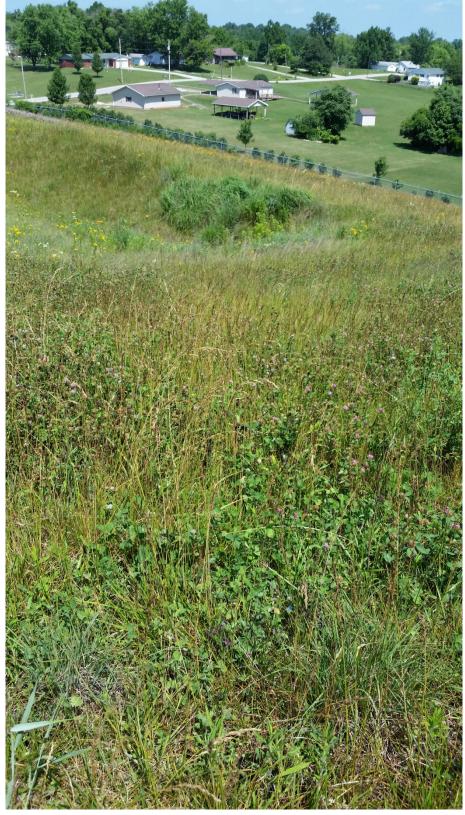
ES4 East Plant Area Cover, east of EV2, facing north.
